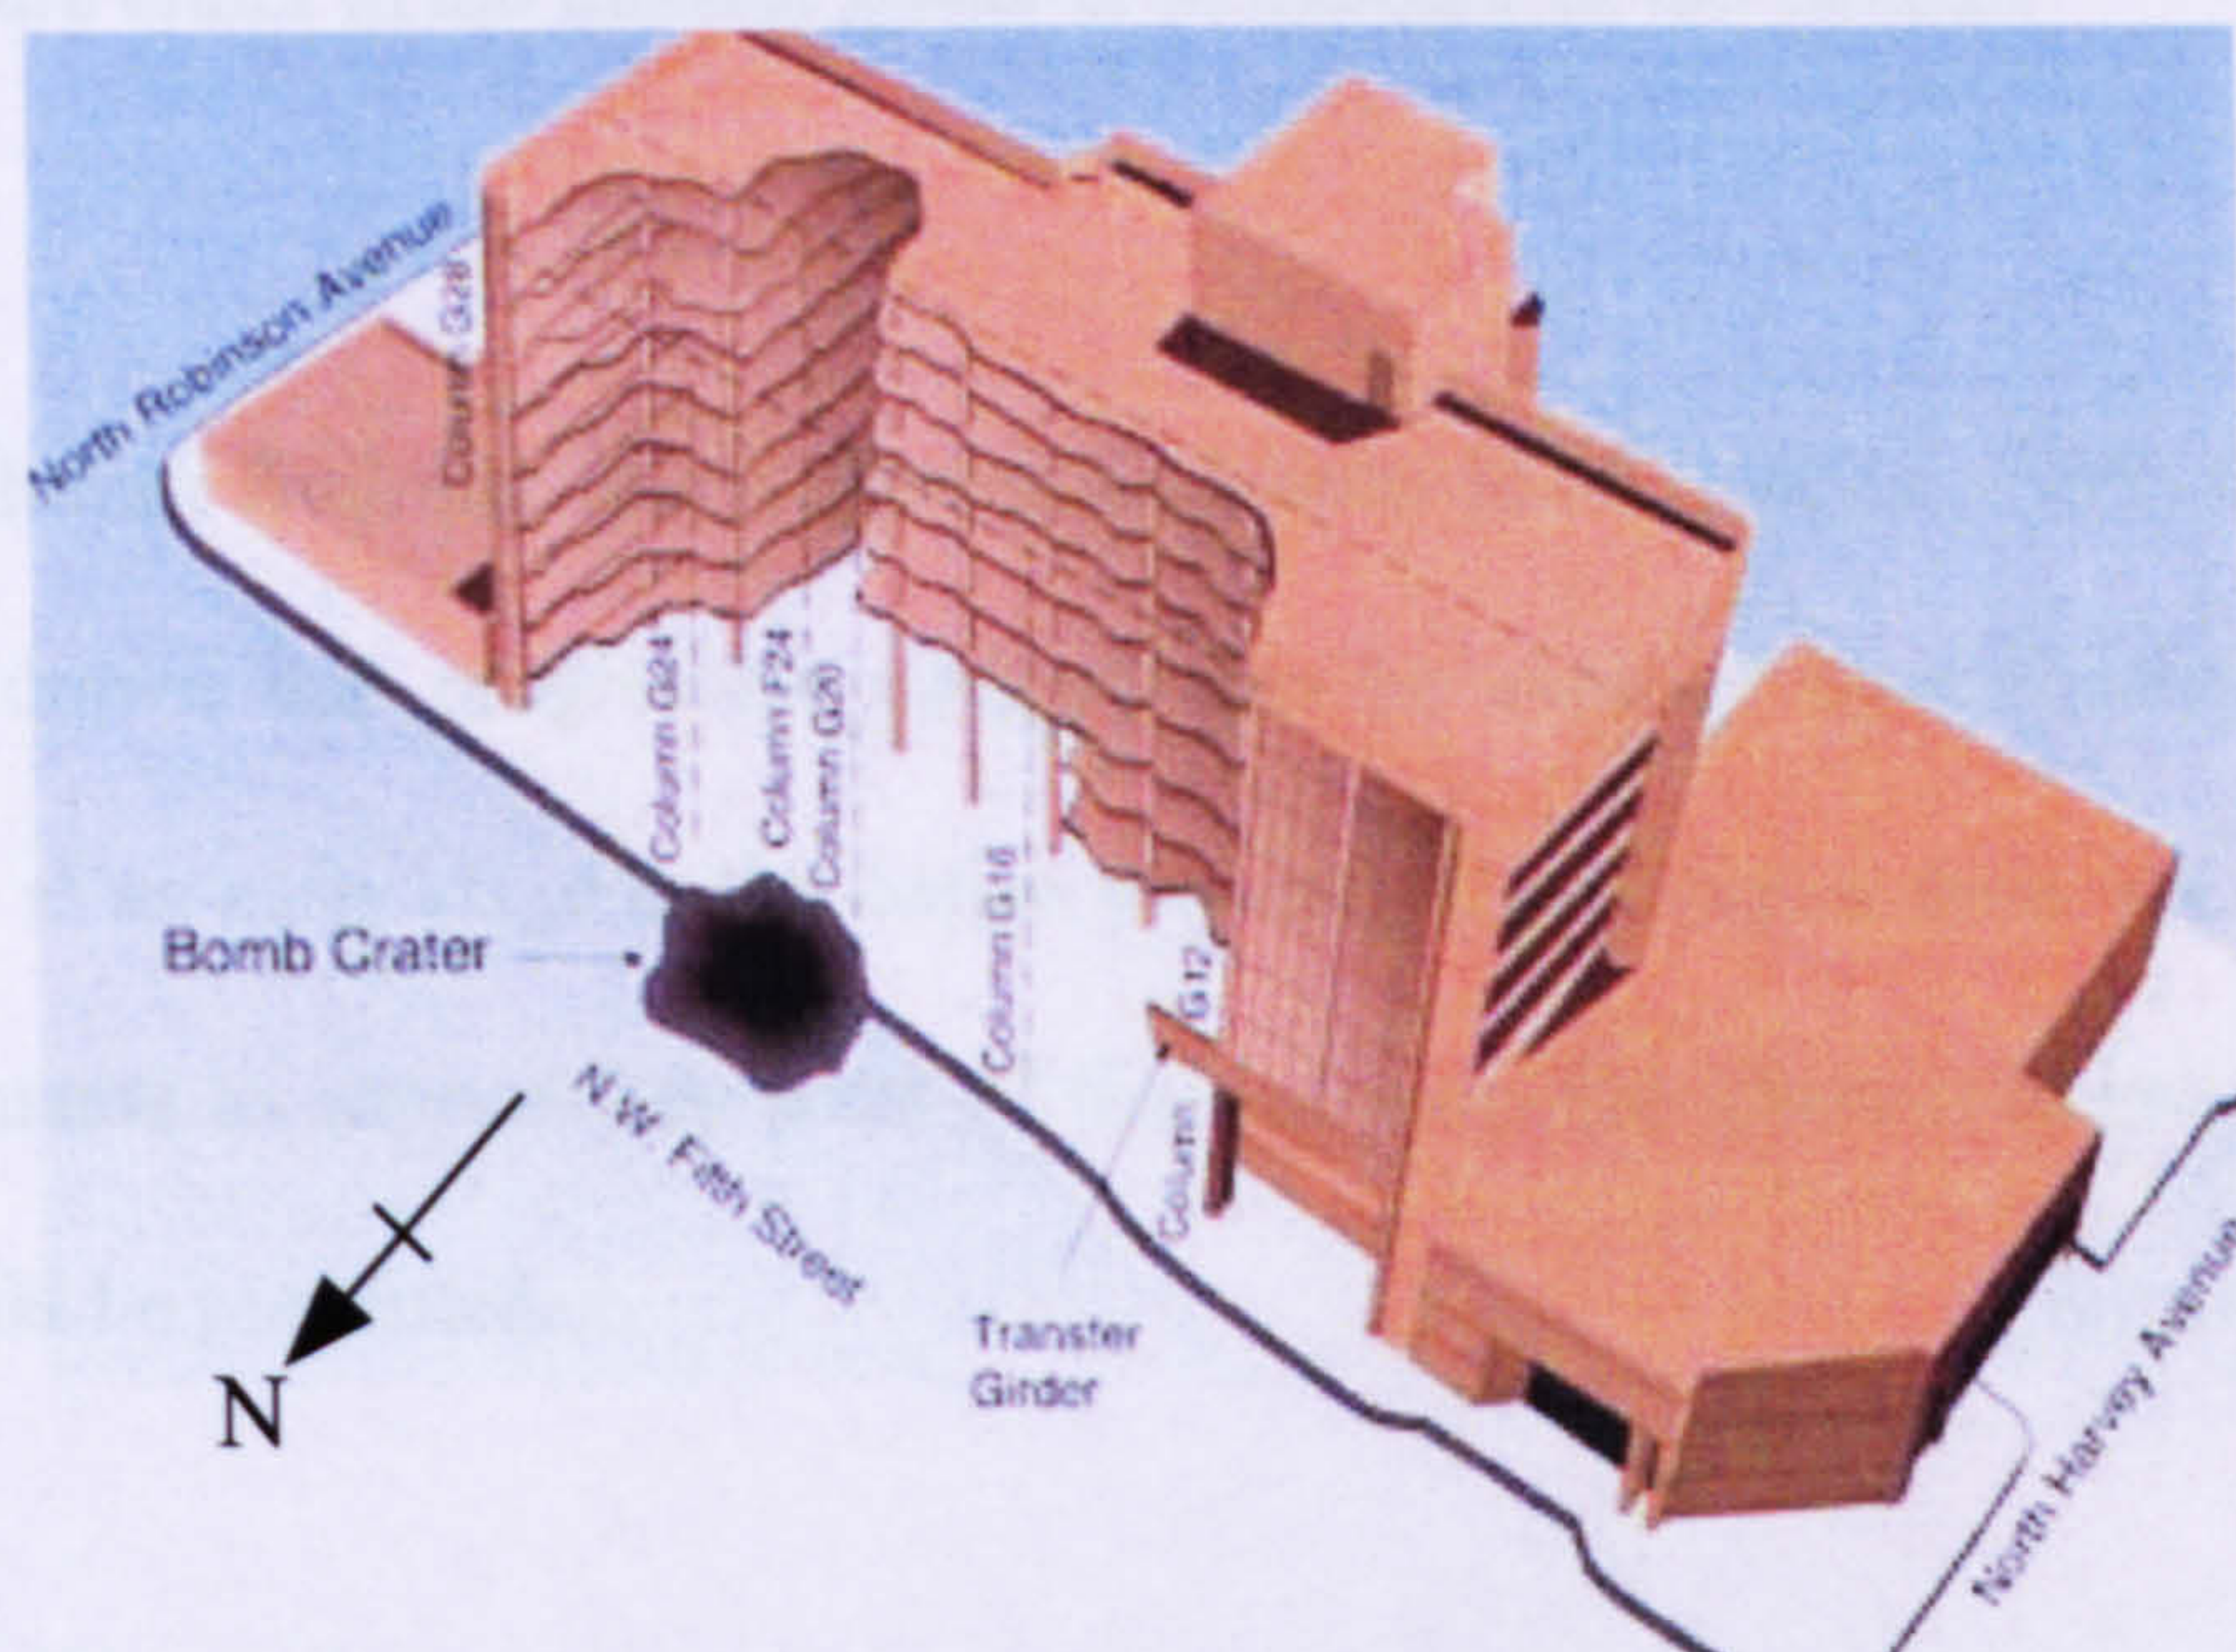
Failure Boundaries in Murrah Building [Corley, 1998]
